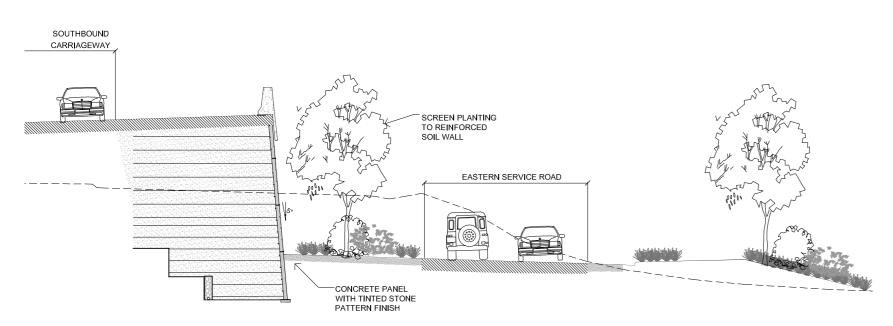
TYPICAL SECTION THROUGH RETAINING WALL WITH ADJACENT PLANTING
